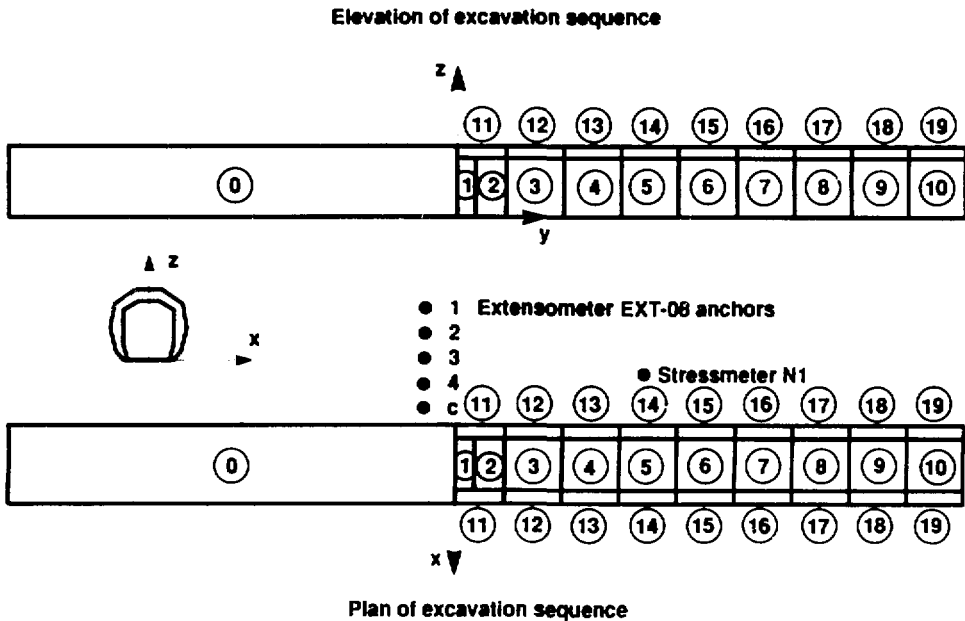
The nineteen excavation steps needed to construct Instrument Room 209 at the Underground Research Laboratory (URL). The pilot hole was excavated in the first ten steps, then enlarged in nine additional steps. The approximate location of one extensometer (EXT-08) and one stressmeter (N1) are shown.
